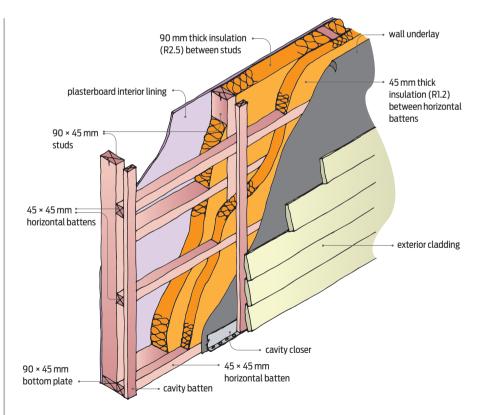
Example from the Beacon Pathway wall workshop – the Zero Energy House wall framing system. For more, visit zeroenergyhouse.co.nz/walls.
